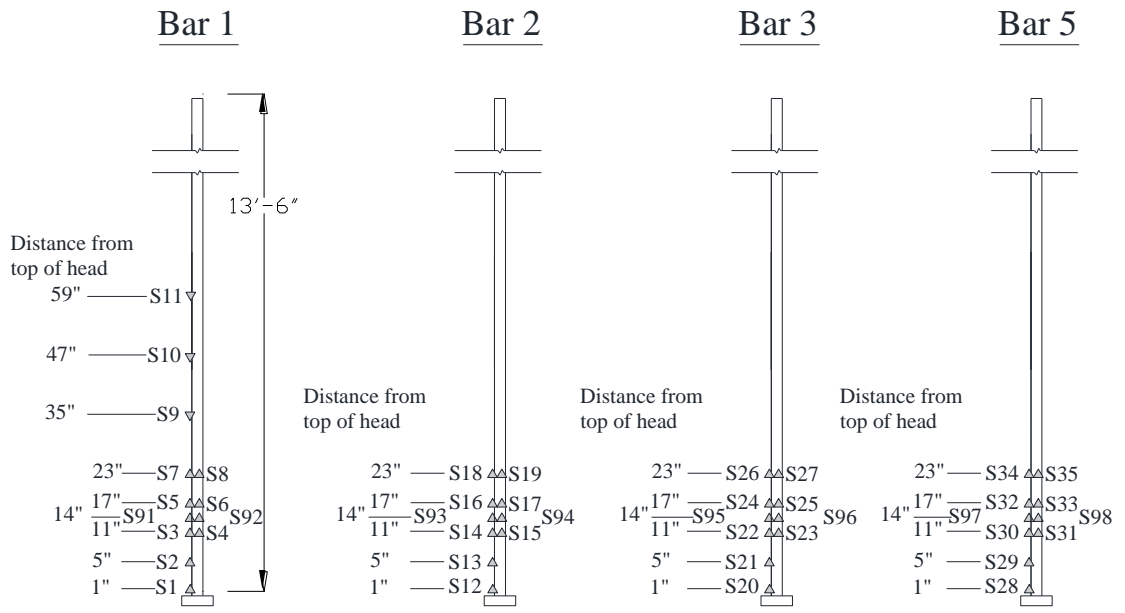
Strain gages on J-bars and vertical stirrups in the slab of Specimen #3
